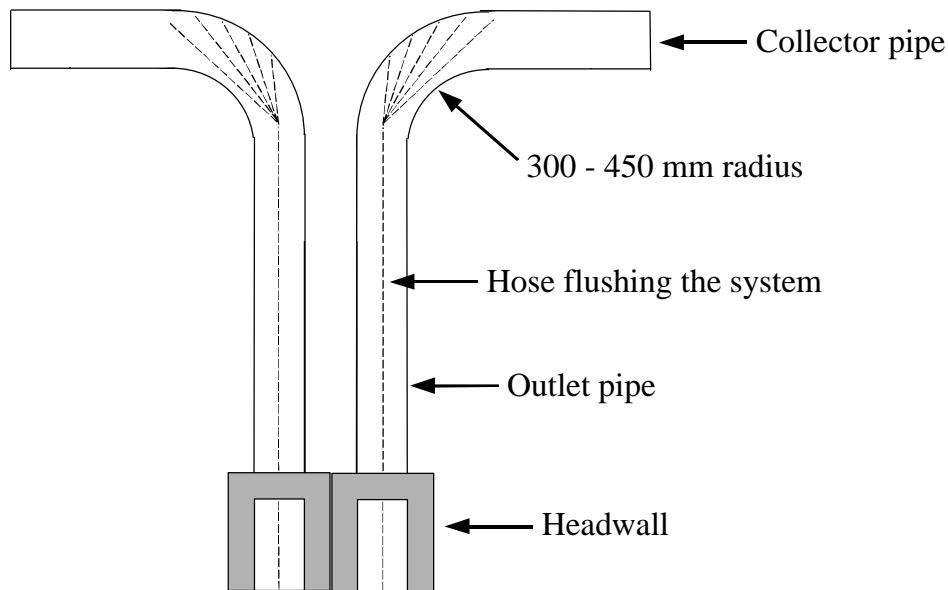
Outlet detail for system cleaning and video camera inspection.
